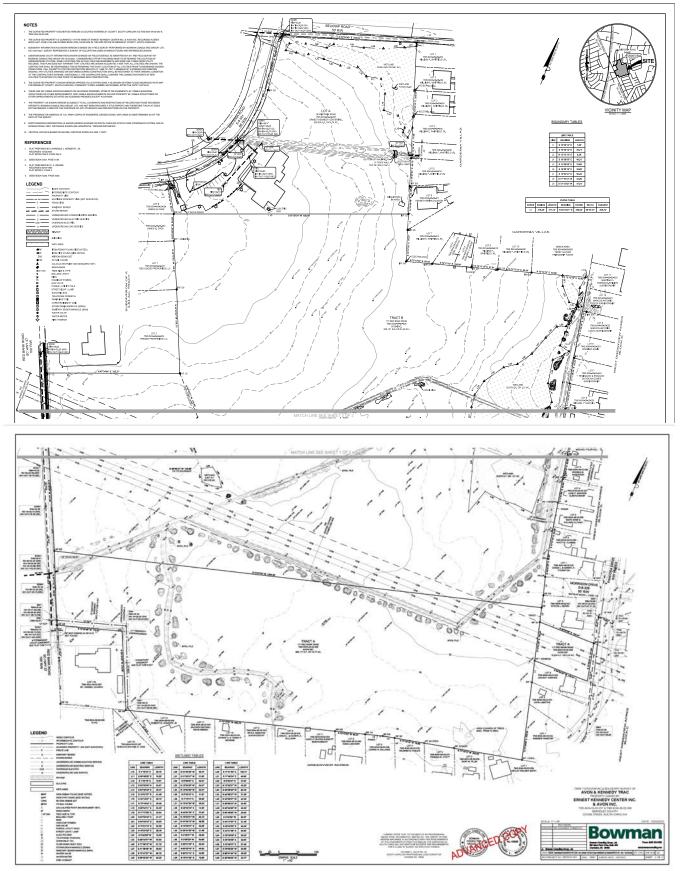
EXHIBIT D - PROPOSED PLANNED DEVELOPMENT LAND USE
